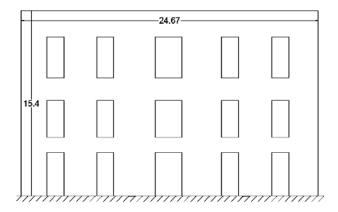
The facade of the wall from Catania Project that is close in shape to the facade of Villa Maria School.
